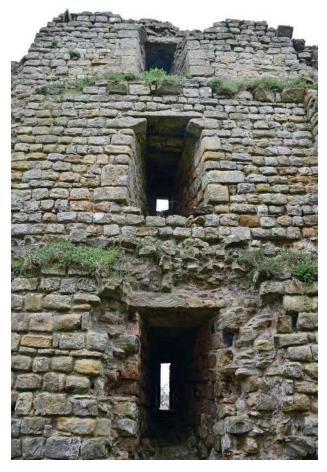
The internal face of the south wall of Thirlwall Castle, highlighting the consistent fabric in different sandstones.
